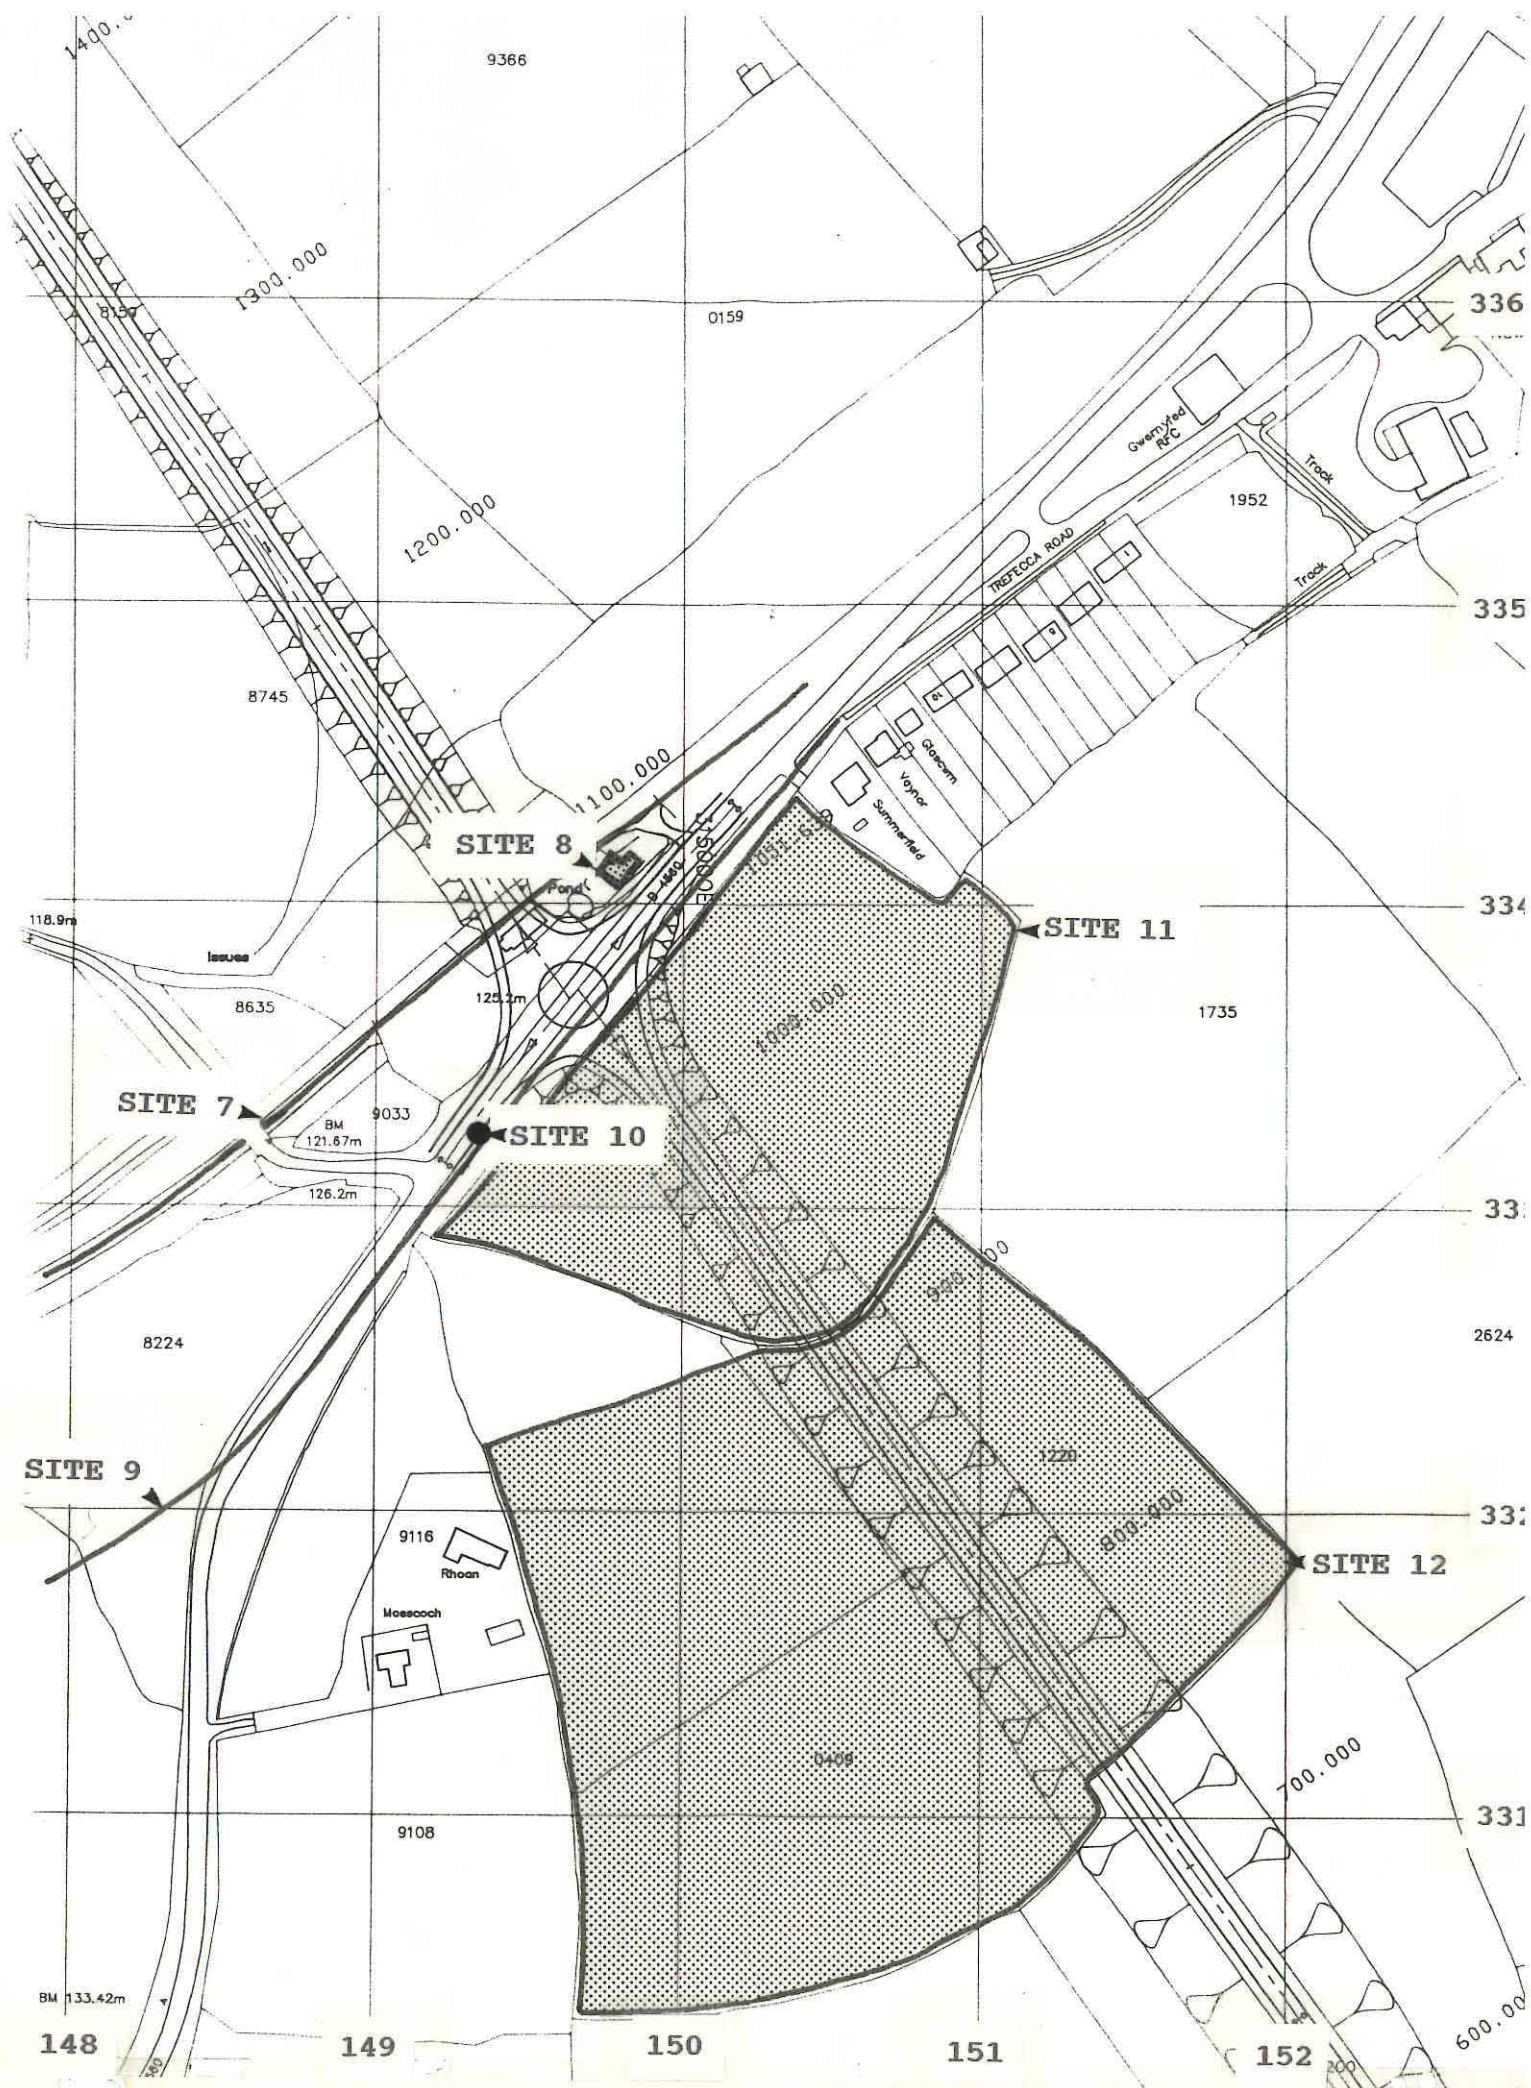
Inset showing the junction between the Talgarth-Trefecca road and the proposed bypass (Scale 1:2500)
